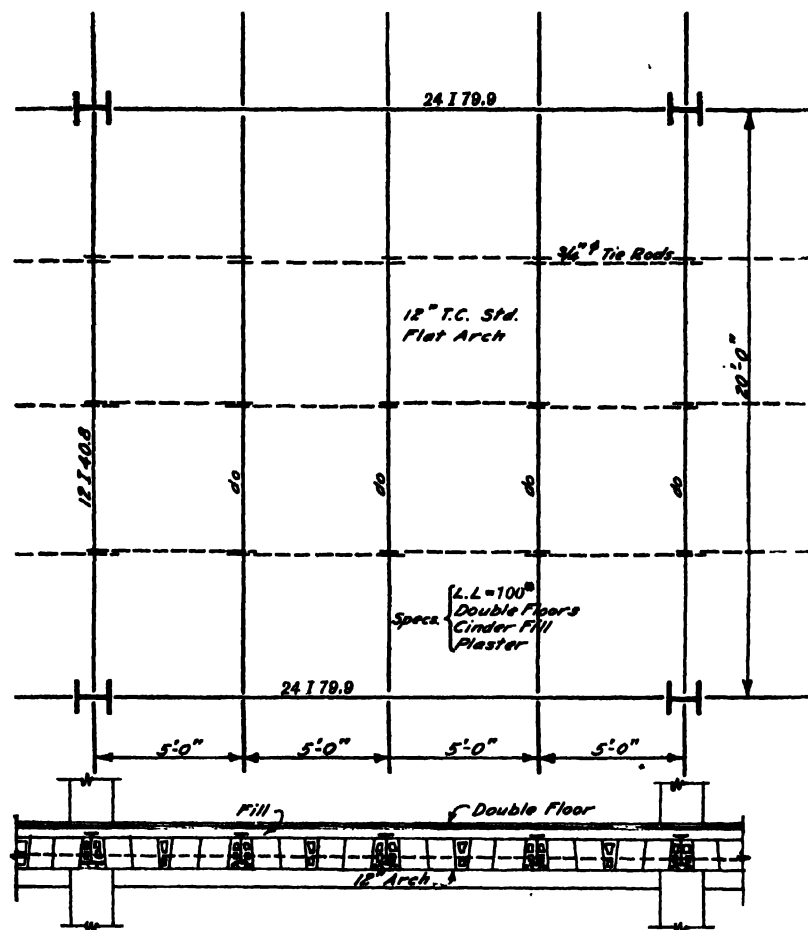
TYPICAL TERRA COTTA ARCH FLOOR PANEL-STEEL FRAME
